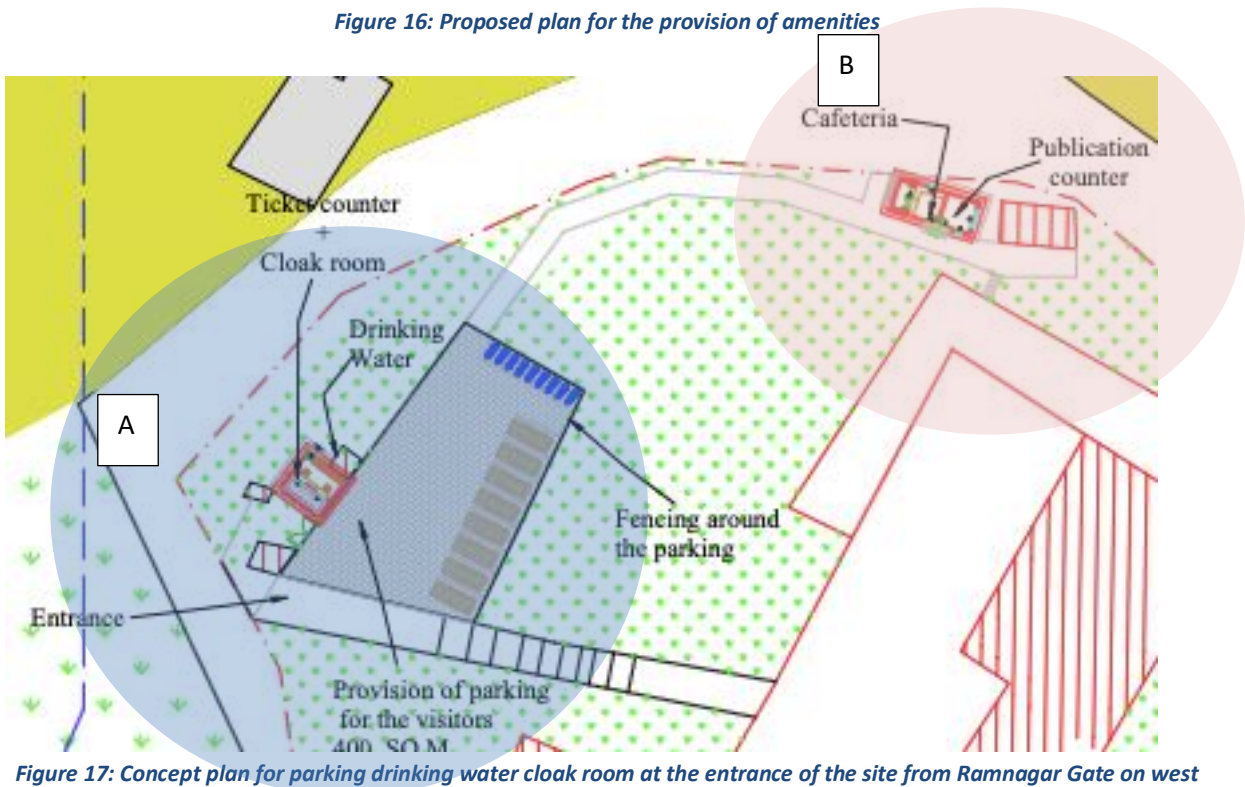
Concept plan for parking drinking water cloak room at the entrance of the site from Ramnagar Gate on west
